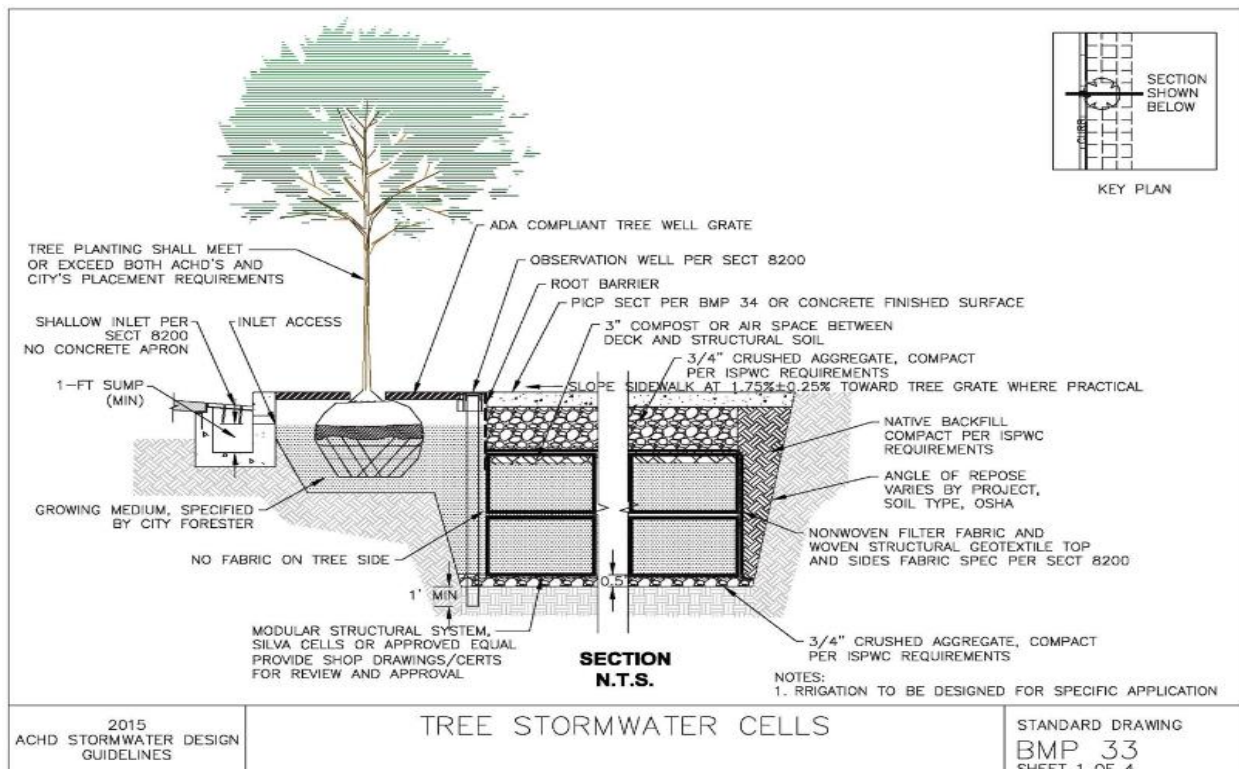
Cross Section Detail of a tree well filter with suspended pavement system installed under sidewalk (Credit: Ada County Highway District Stormwater Design Guidelines)
